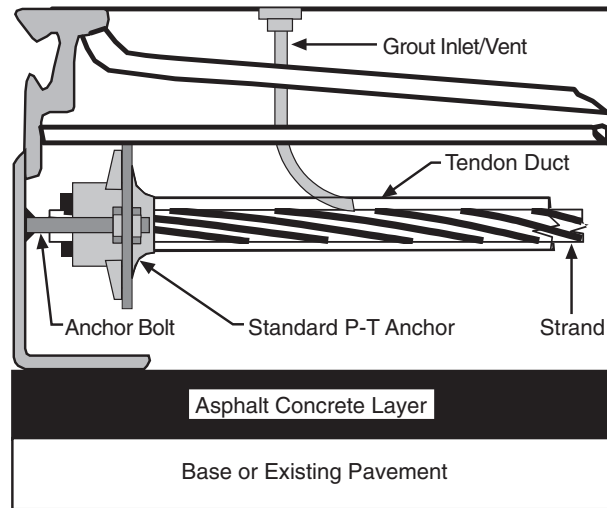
Standard post-tensioning anchor cast into the joint panel
